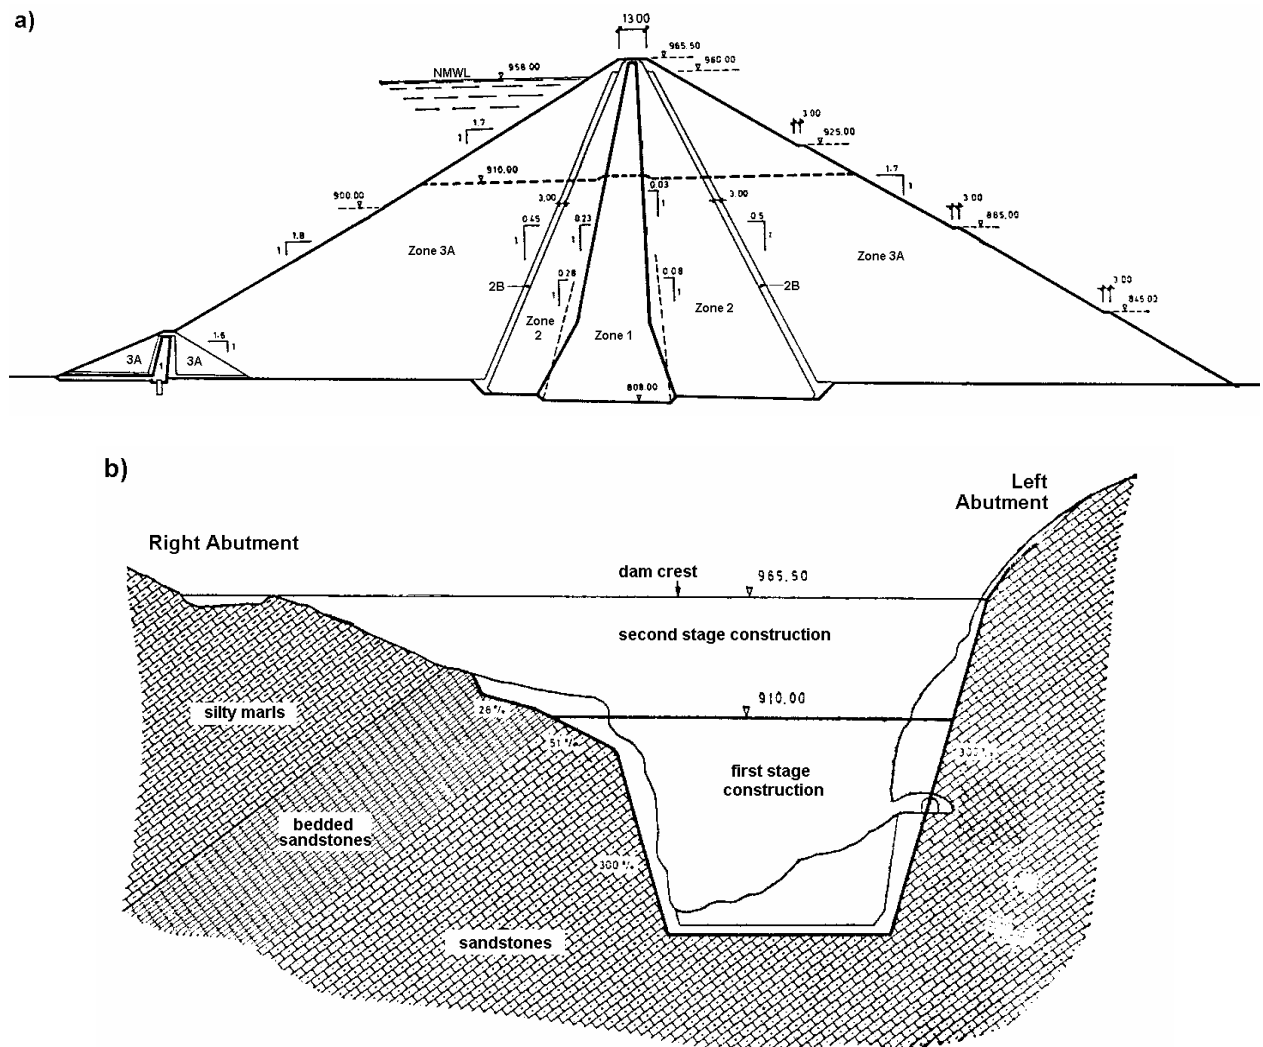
Canales dam, (a) typical section, and (b) longitudinal section (Bravo 1979).
